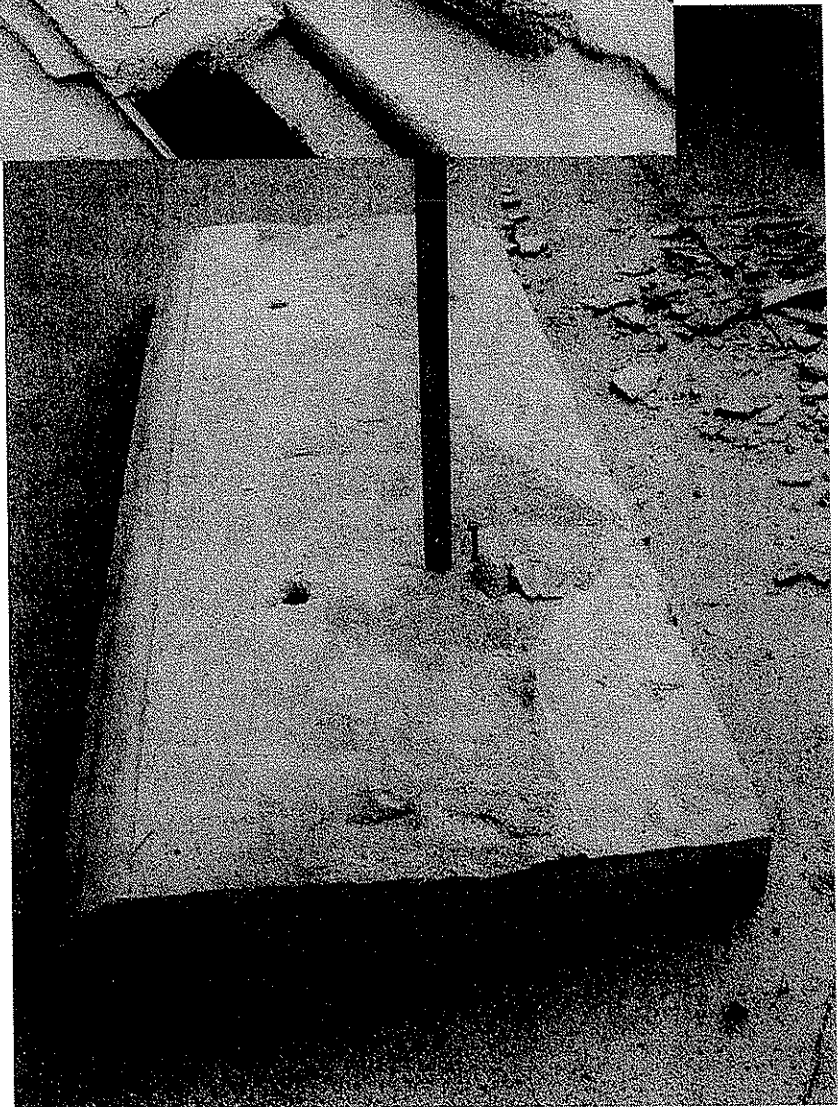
Tapcon Screws Most Likely Used for Leveling of Precast Stone Unit
